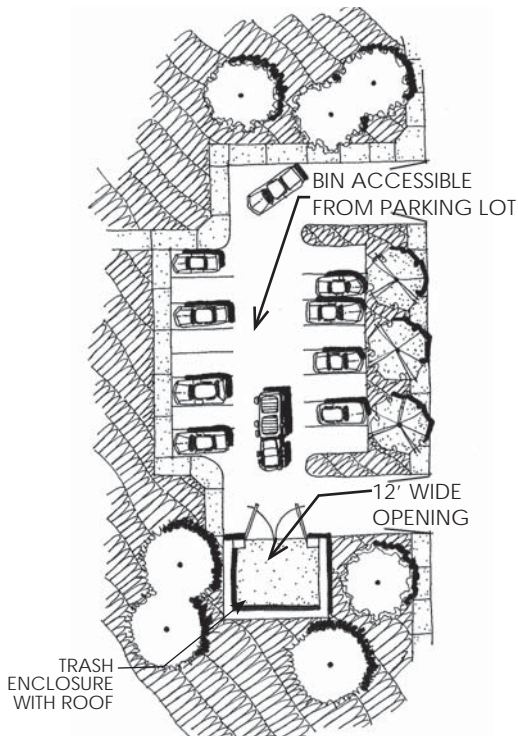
Parking Lot Design with Trash Bin Enclosure
